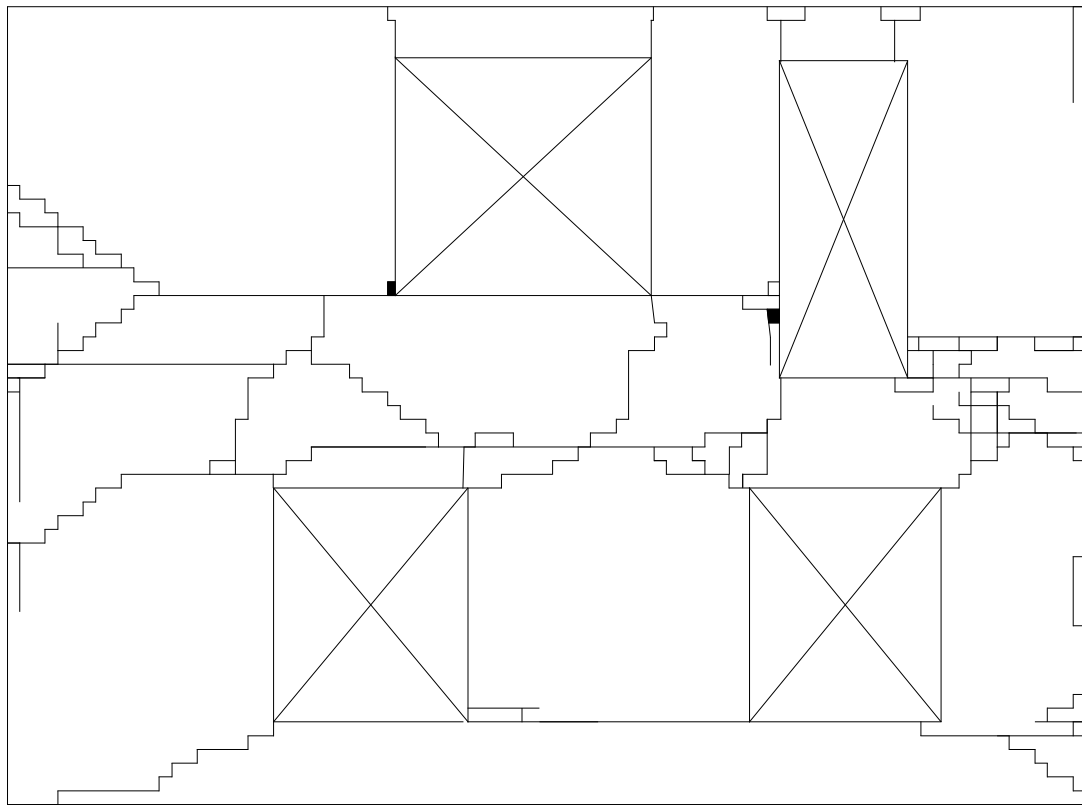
Cracks in Side 2 noted up to the end of Stage G
